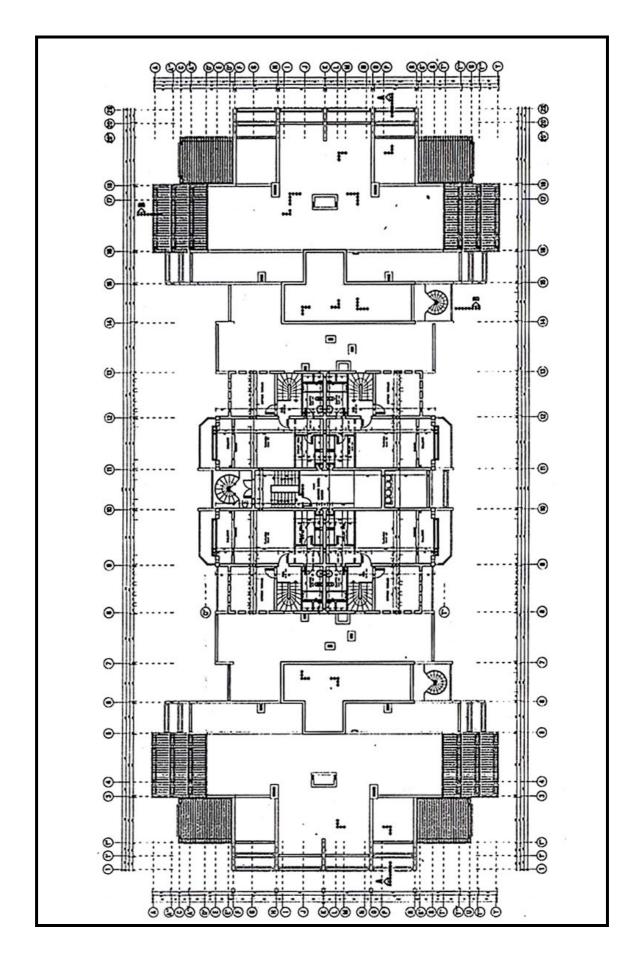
Mavişehir II; Kuğu 22nd-Floor Plan
